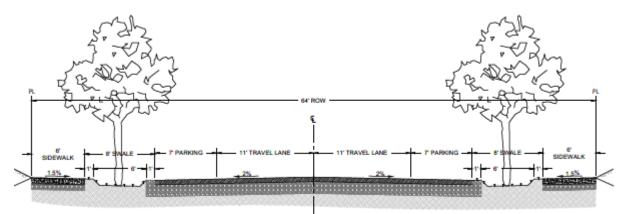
Local Street Section, Parking on Both Sides. Source: Ashley & Vance Engineering.
